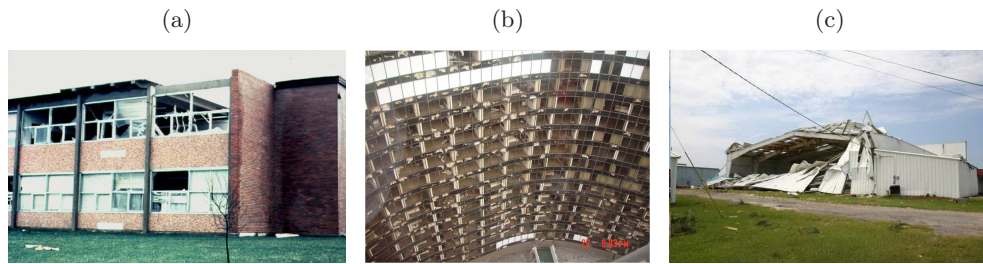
Wind damage to different types of structures. (a) Window breakage and roof uplift from an isolated low-rise structures, (b) Building facade damage to an urban high-rise structure, (c) Building envelope failure for a portal framed steel storage building (AAWE, 2011).
